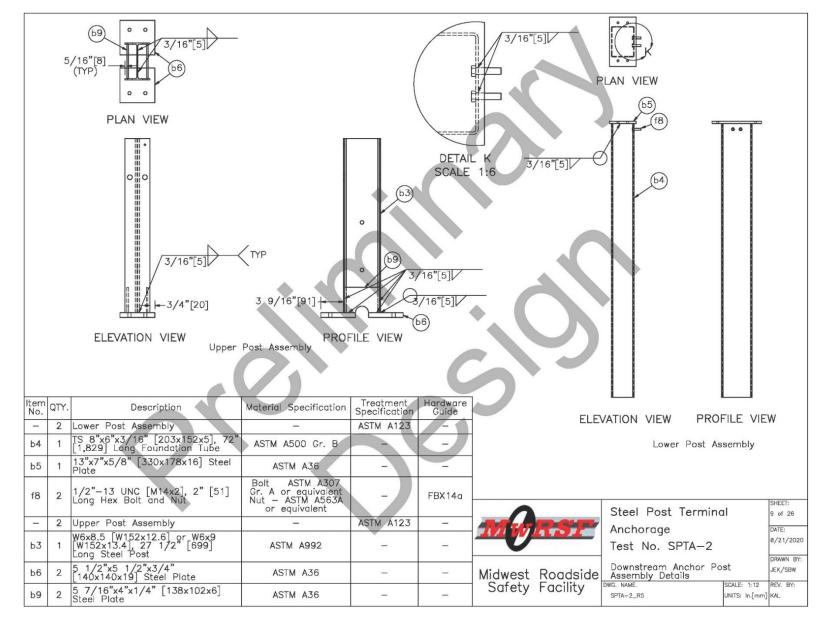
Downstream Anchor Post Assembly Details, Test No. SPTA-2
